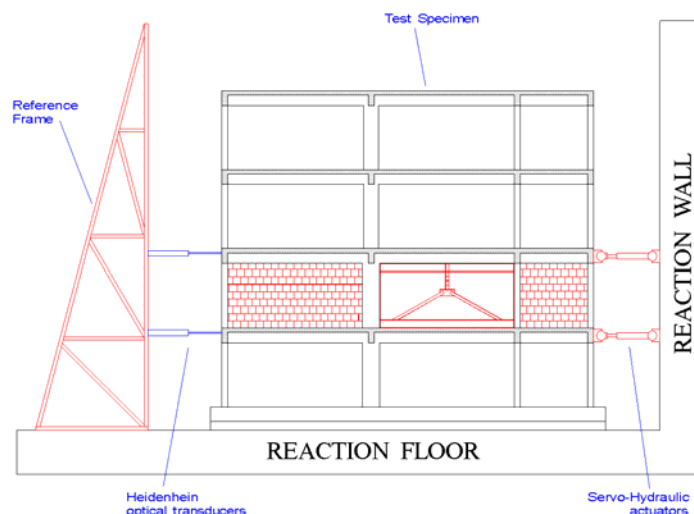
General layout of the 2<sup>nd</sup> storey cyclic test: reaction-wall, structure, pistons and reference steel-frame
